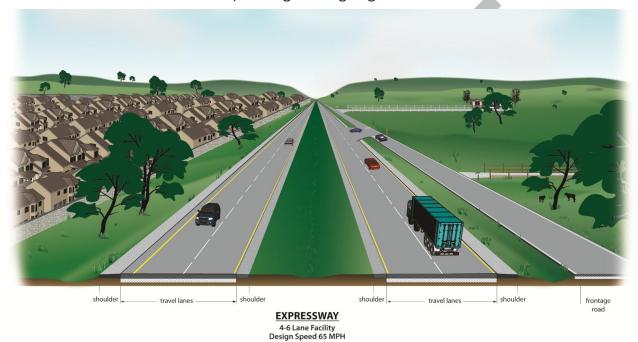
Typical Expressway w/ Frontage Road Cross Section
